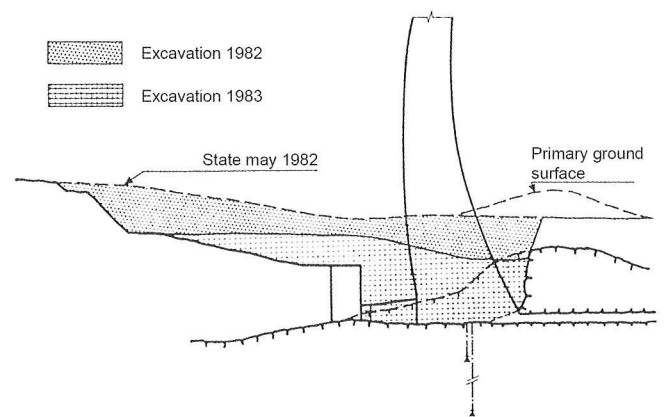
Zillergründl arch dam, overburden and rock excavation in the valley bottom (Schöberl 1987).
